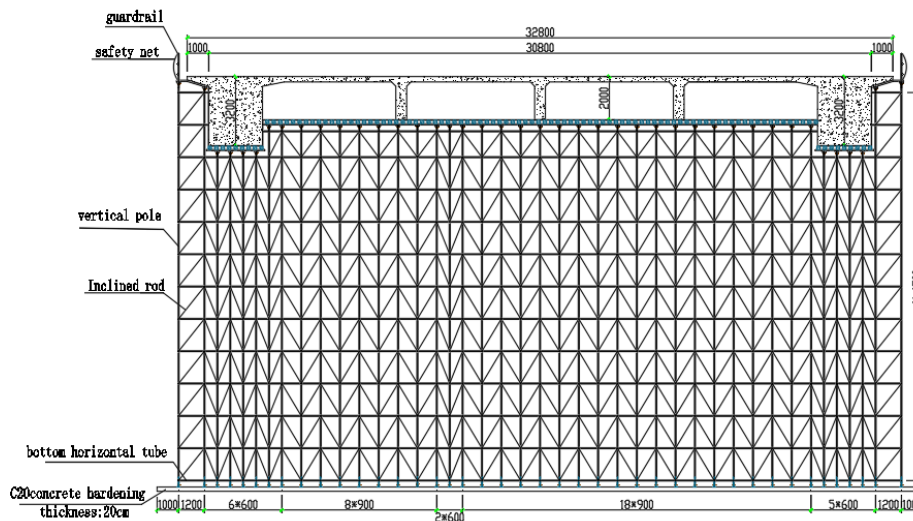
Typical cross section of K2 ~ K5 axis support layout
